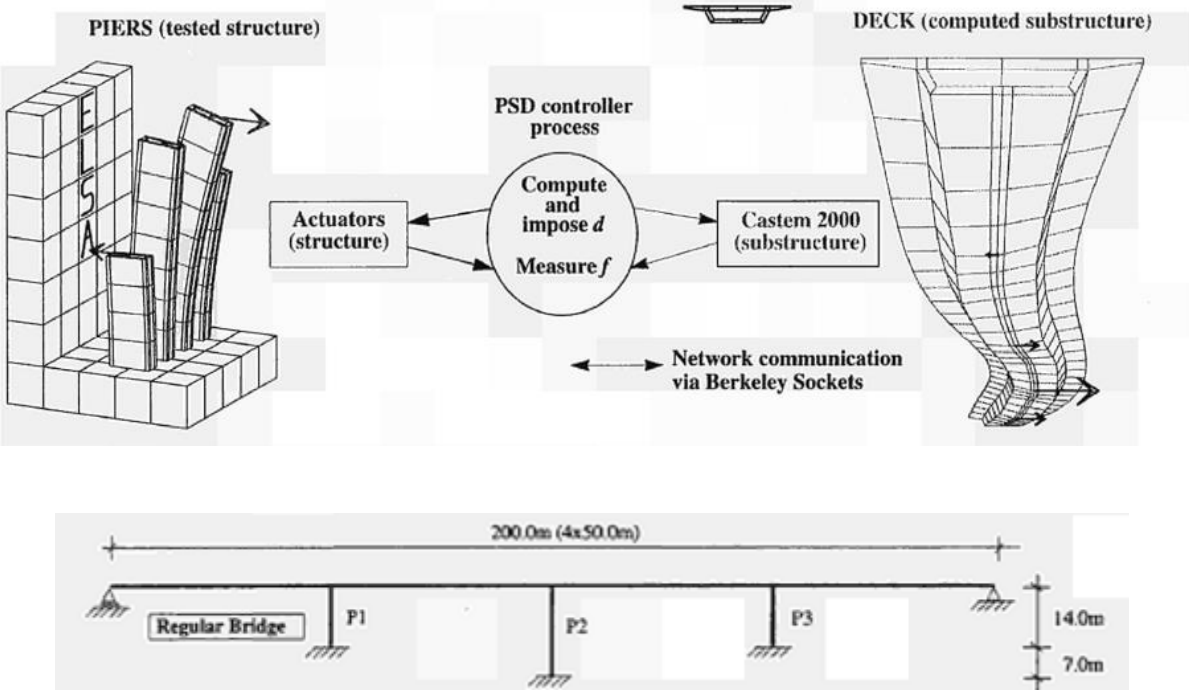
Pseudo-dynamic testing of a 1:2.5 Scaled R/C bridge: plan view of the tested R/C bridge ELSA, Ispra, Italy (Pinto et al 1996).
